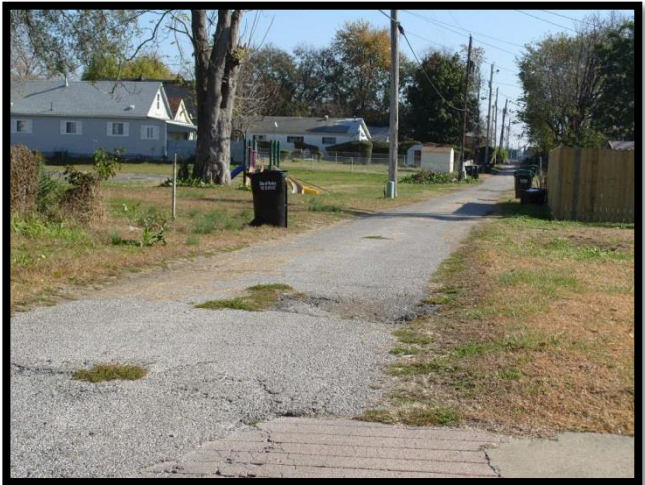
Alley between Market Street and Logan Street (view east from Baucum Street).
